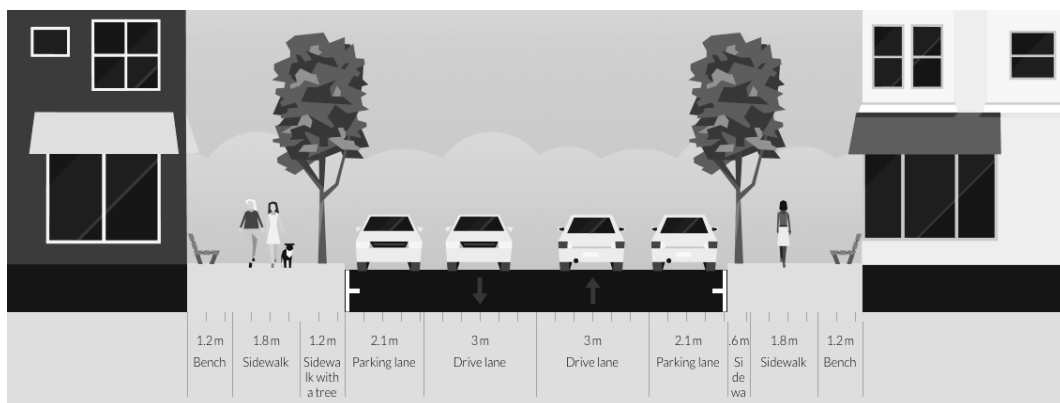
Street width: 18 m. Street consisting of sidewalks, space for greenery, drive lanes and parking lanes. Designed with streetmix.net.
